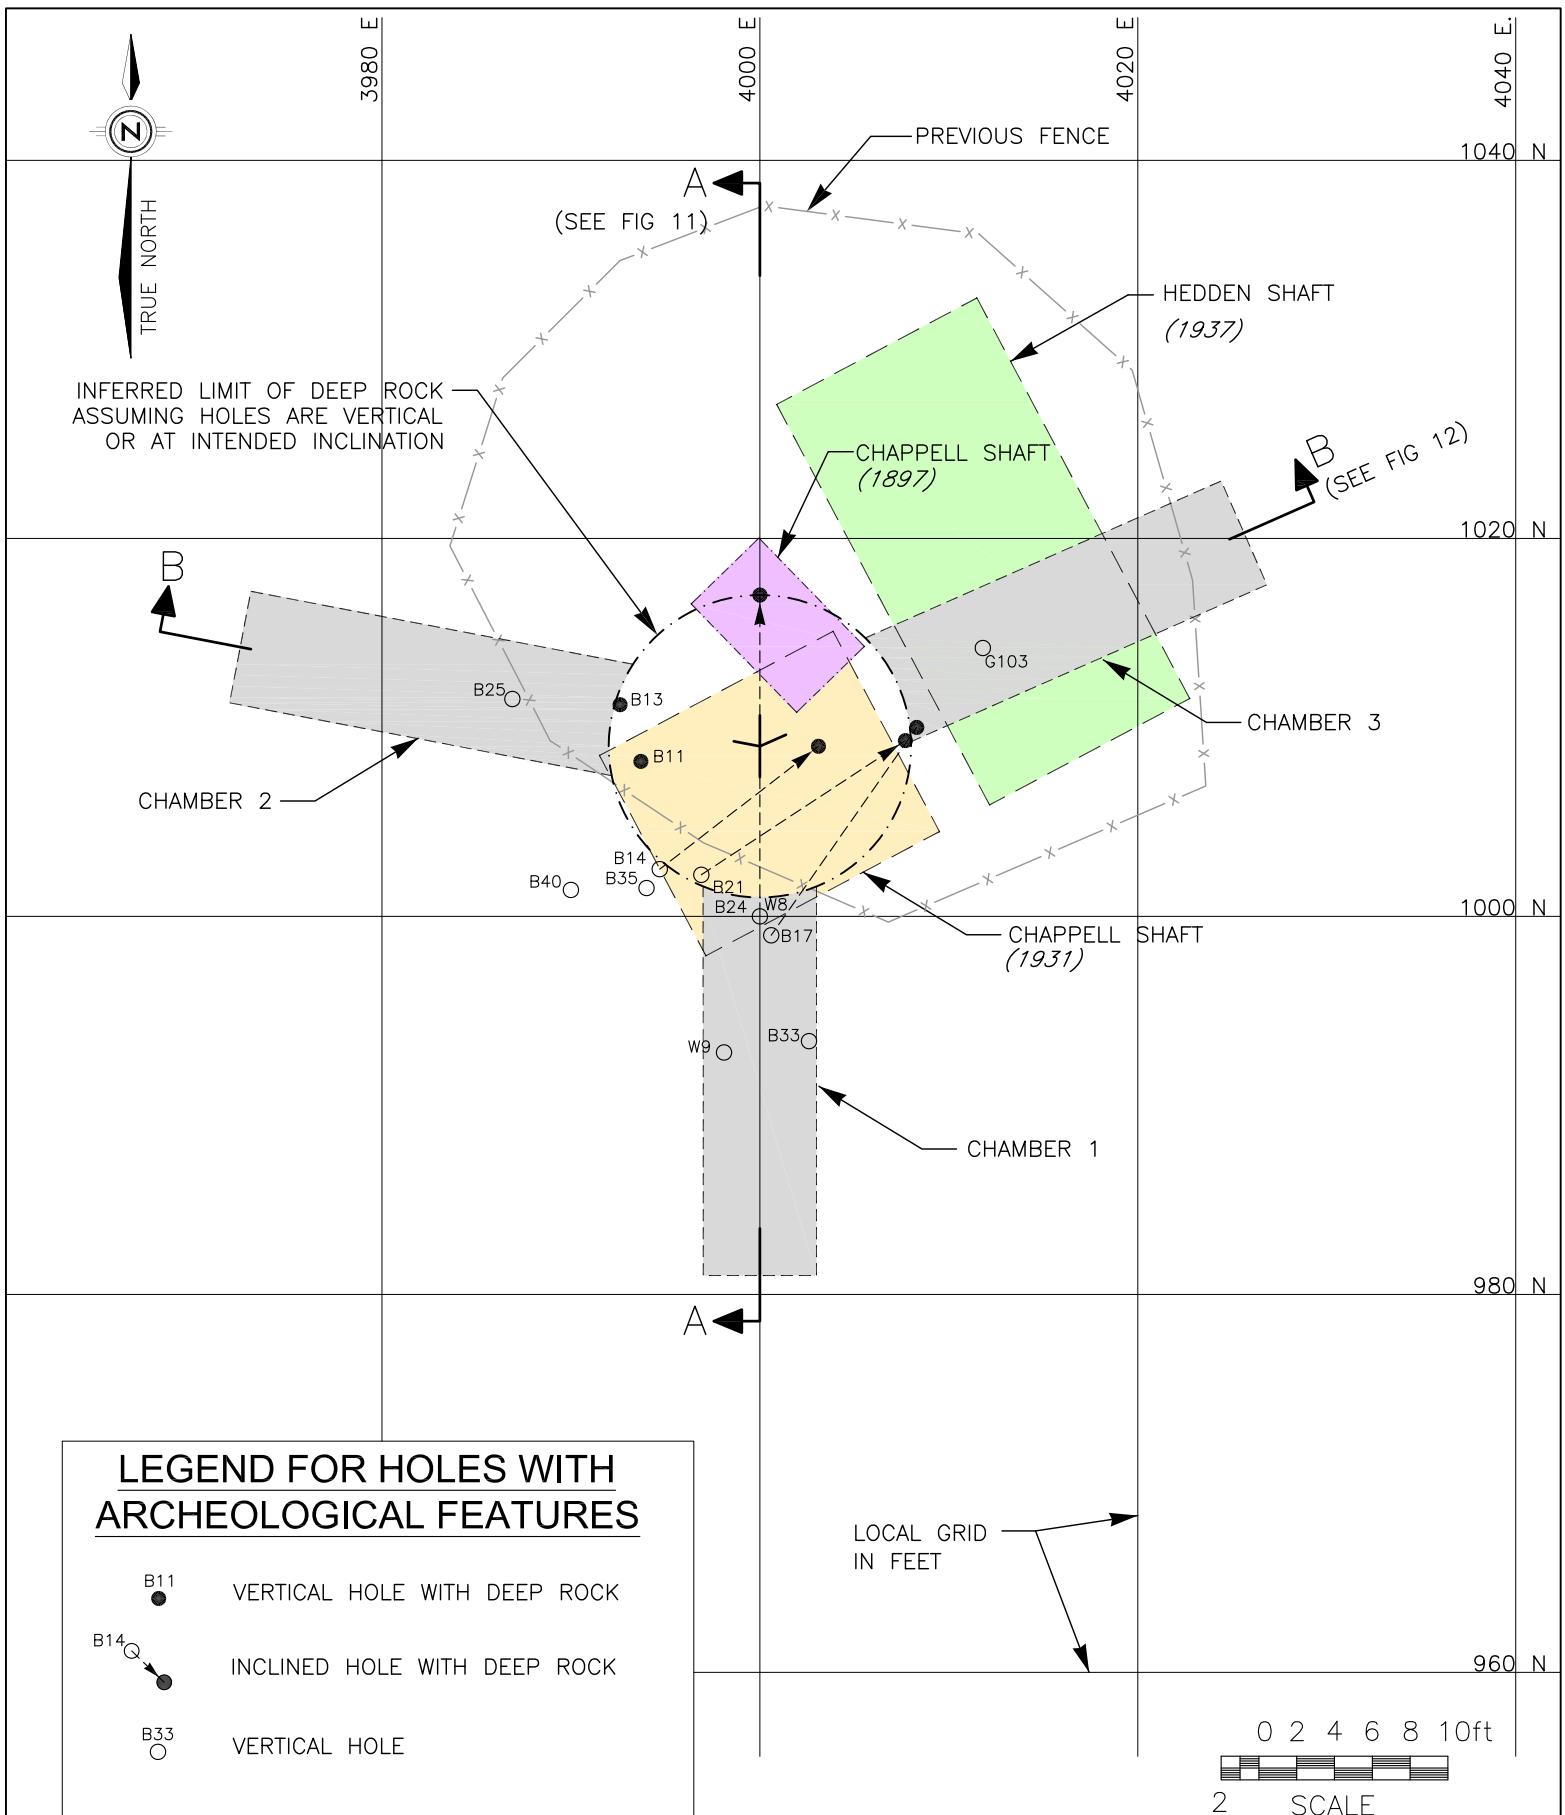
PLAN SHOWING POSSIBLE CONFIGURATION OF CHAMBERS AT 200 FEET DEPTH
